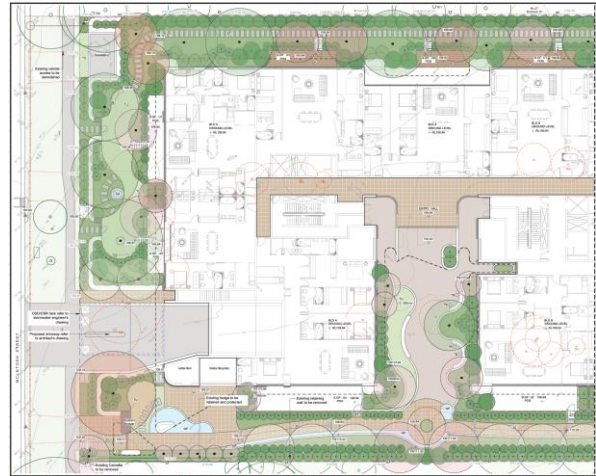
Revised landscape plans for Buildings A & B (Studio IZ)
